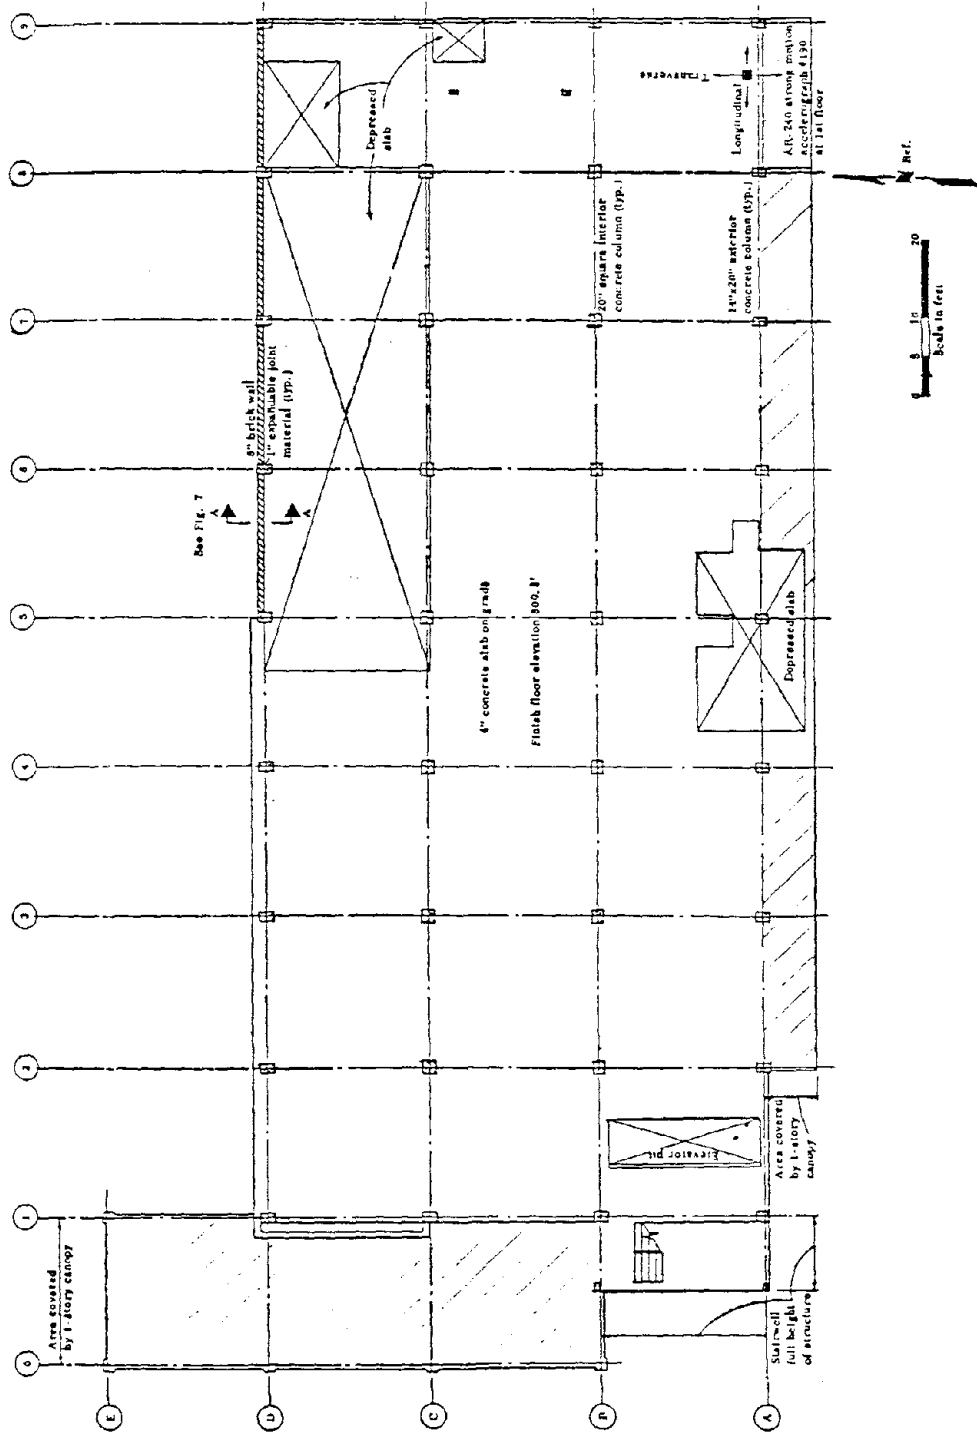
HOLIDAY INN, ORION AVENUE. FIRST-FLOOR PLAN.
